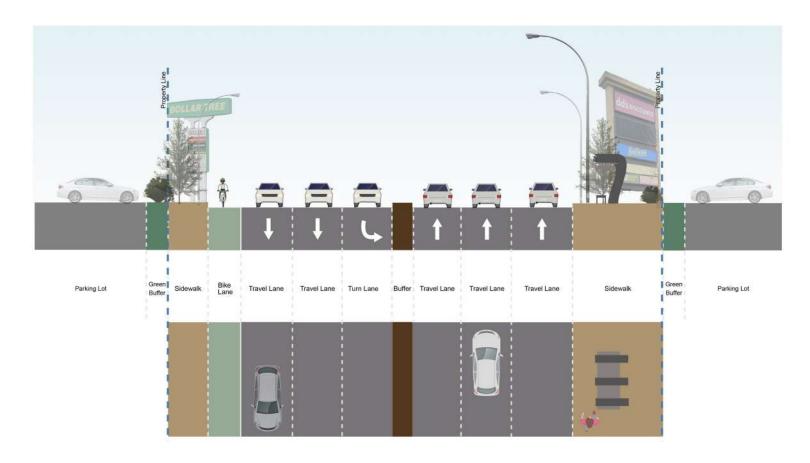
Existing Street Section - E. Kings Canyon Rd. @ S.Clovis Ave.
